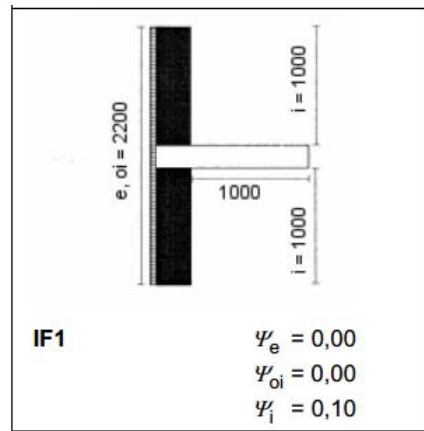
A construction detail with no thermal bridging effect (adapted from ISO (2007))
